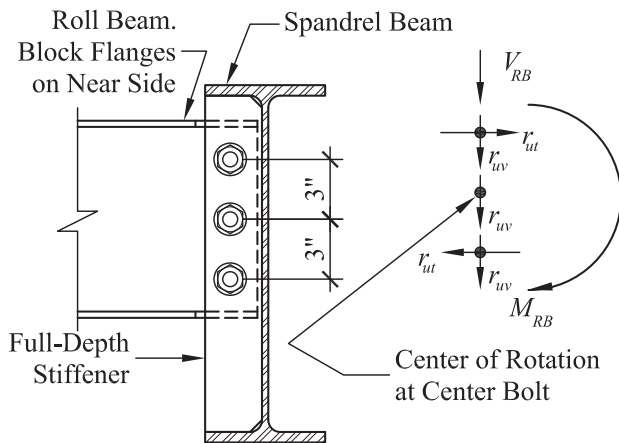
Forces on bolts at roll beam to spandrel beam connection.
